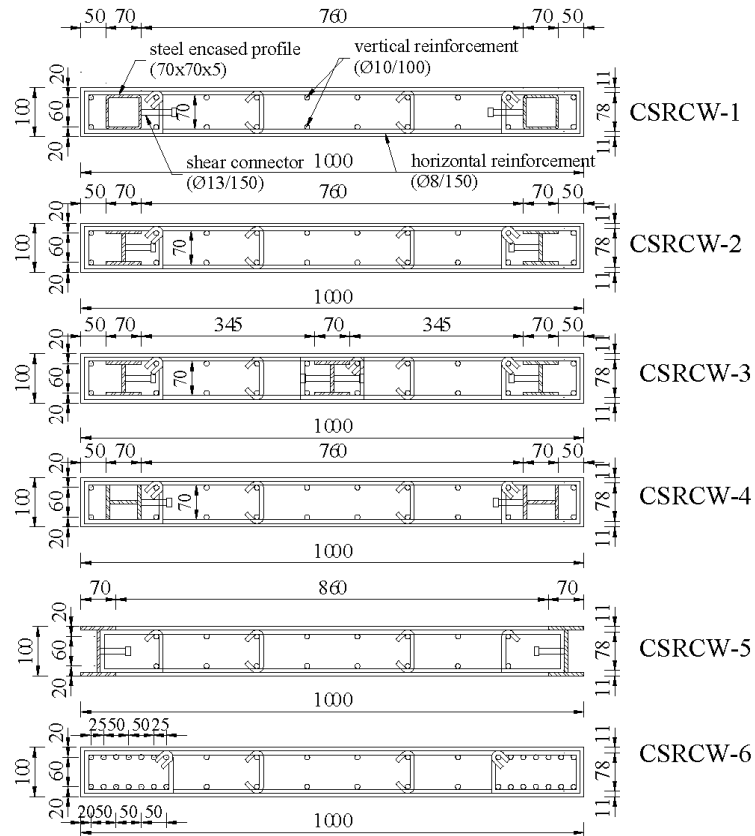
b* – Details of the steel concrete composite shear walls.
